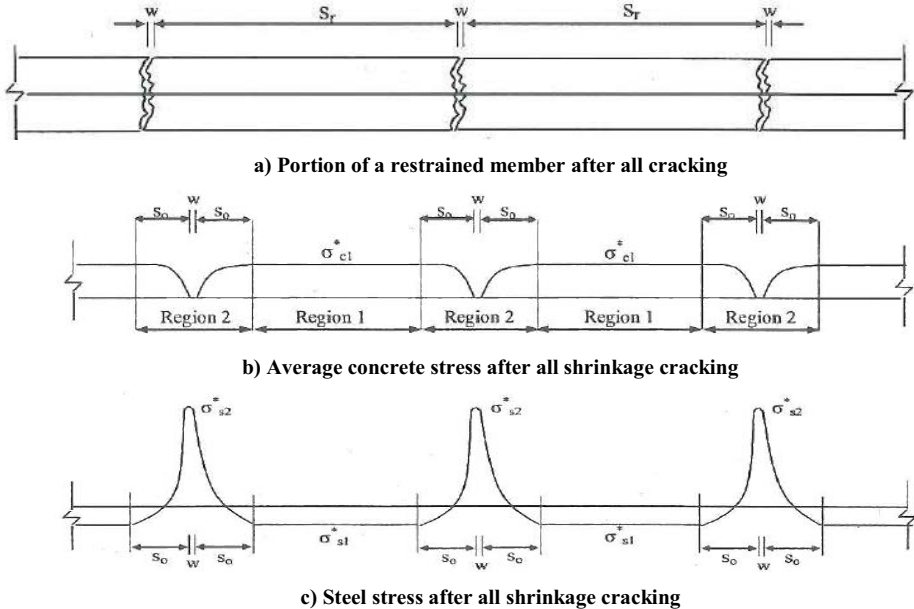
Final concrete and steel stresses after direct tension cracking [10]
